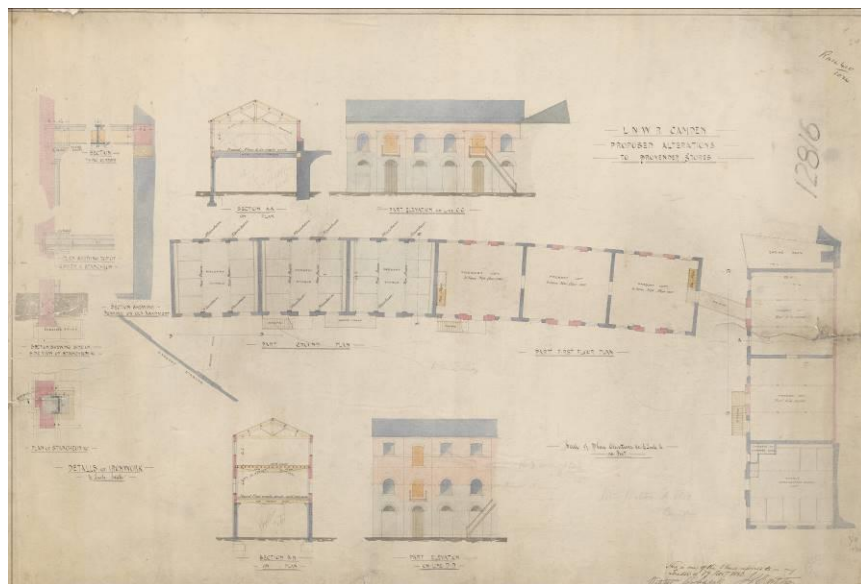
Drawing dated 17th November 1880 showing proposed alterations to Provender Store.
